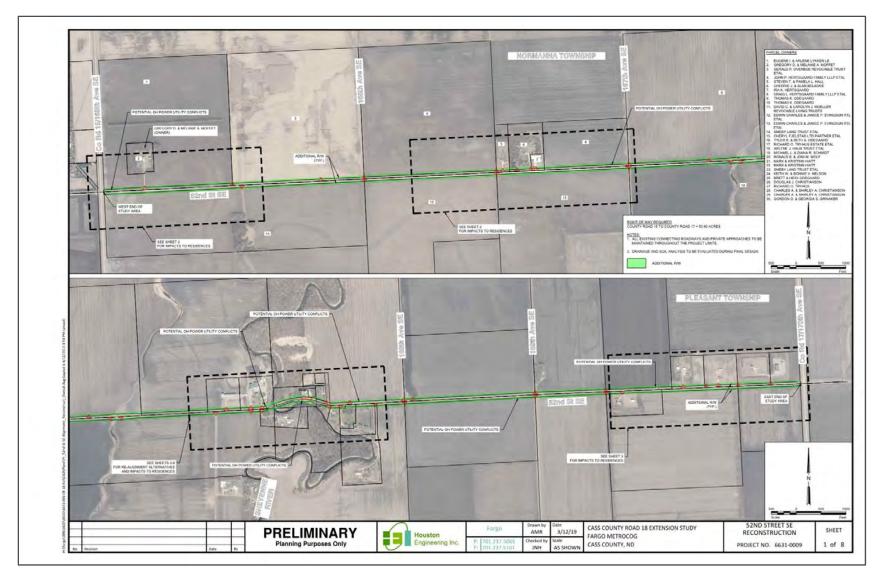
Existing Alignment with Cass County Typical Roadway Section Alternative
